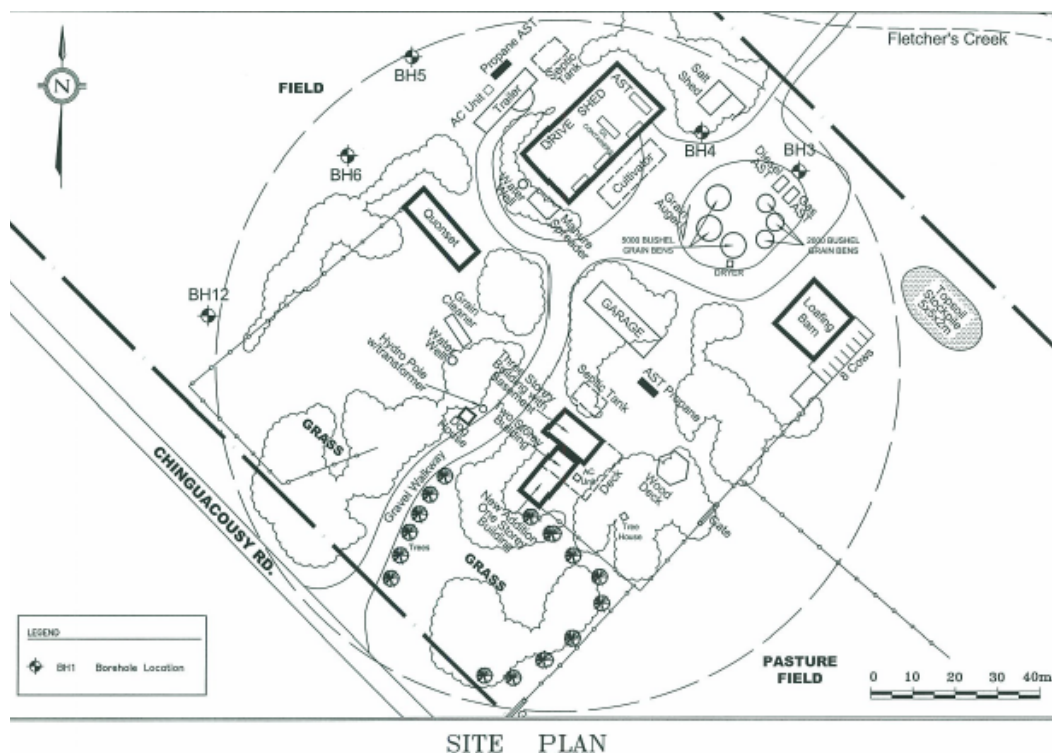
Site Plan showing the two storey limestone residence with its later additions and outbuildings (Source: Terraprobe, 2006)
